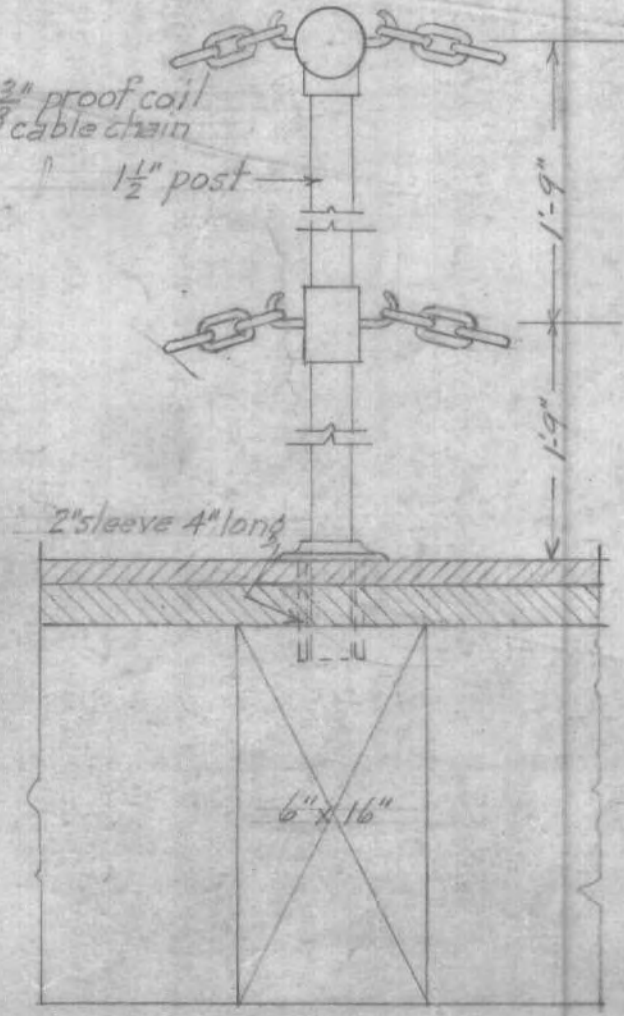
DETAILS AT OPENINGS FOR OVERHEAD DOORS
